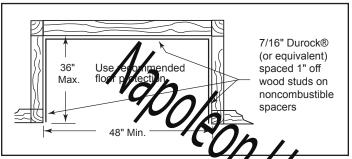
Alcove floor plan. Sheetrock of from face butts to Durock® (or equivalent) alcove lining.
